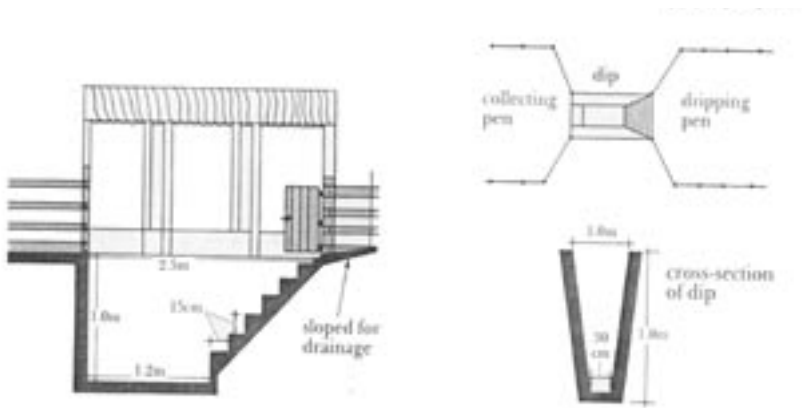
A goat/Sheep dip tank; plan and side elevation
